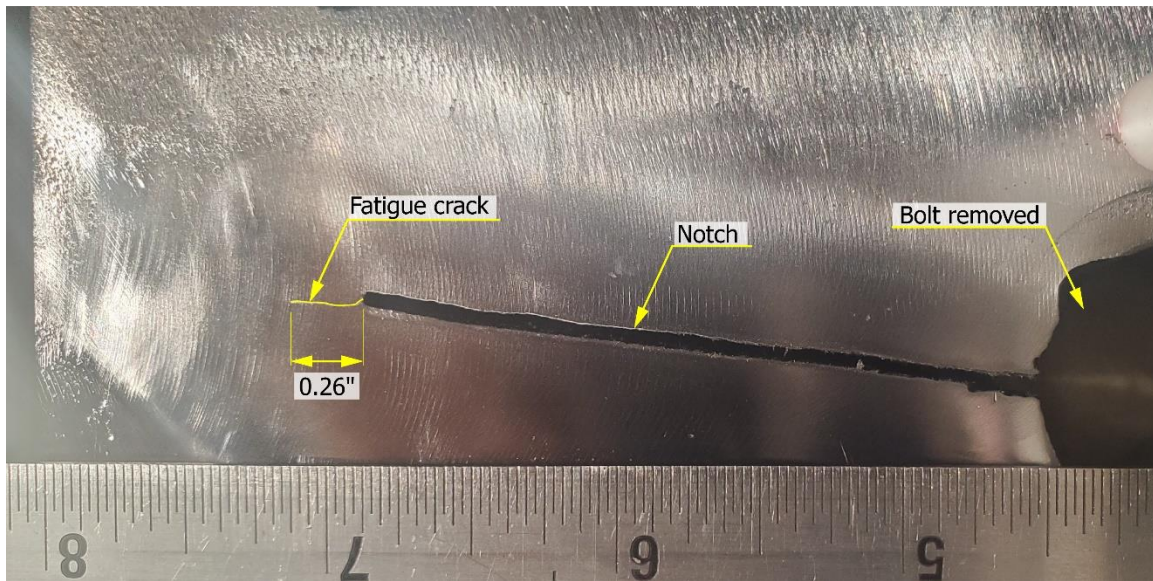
Specimen B1: initial notches on the East bottom flange edge
